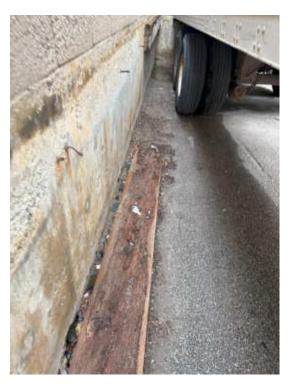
Loading Dock Area Retaining Wall. (Note deteriorated wood bumper guard on ground.)
